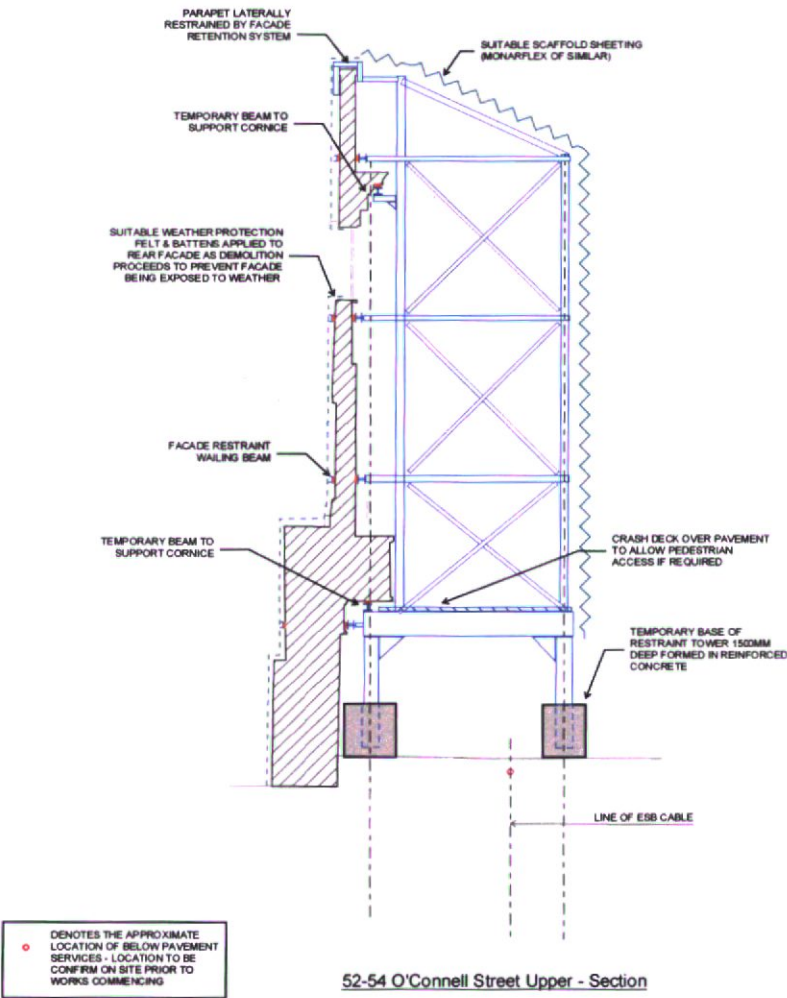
52-54 O’Connell Street Upper (Section – Typical Façade Restraint System)
